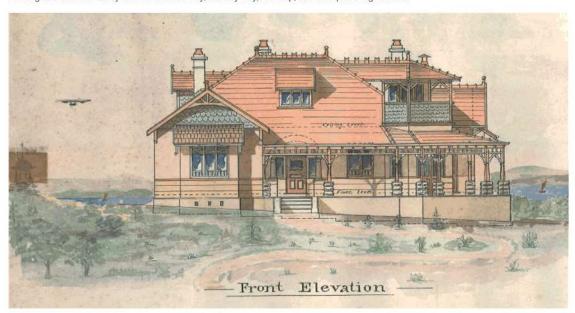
Front elevation of the proposed residence to Fitzwilliam Road, 1909, showing the scenery backdrops to the distant opposite shore line and gap behind the house. Source: Prof. G. Murrell
